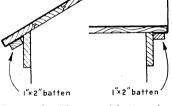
The use of battens for holding the edges of roll roofing at eaves.
